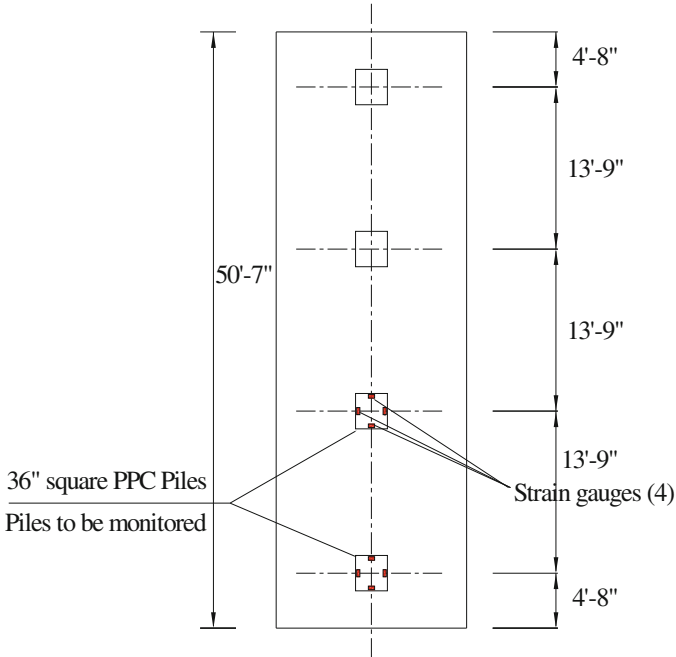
Plan view of piles layout and Bent 1 top view dimensions.
